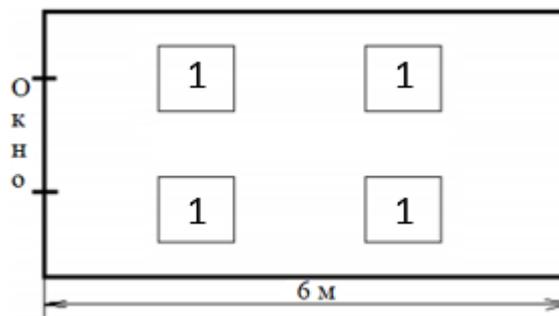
Layout of fixtures at the workplace of a lighting engineer: 1- fixtures.
